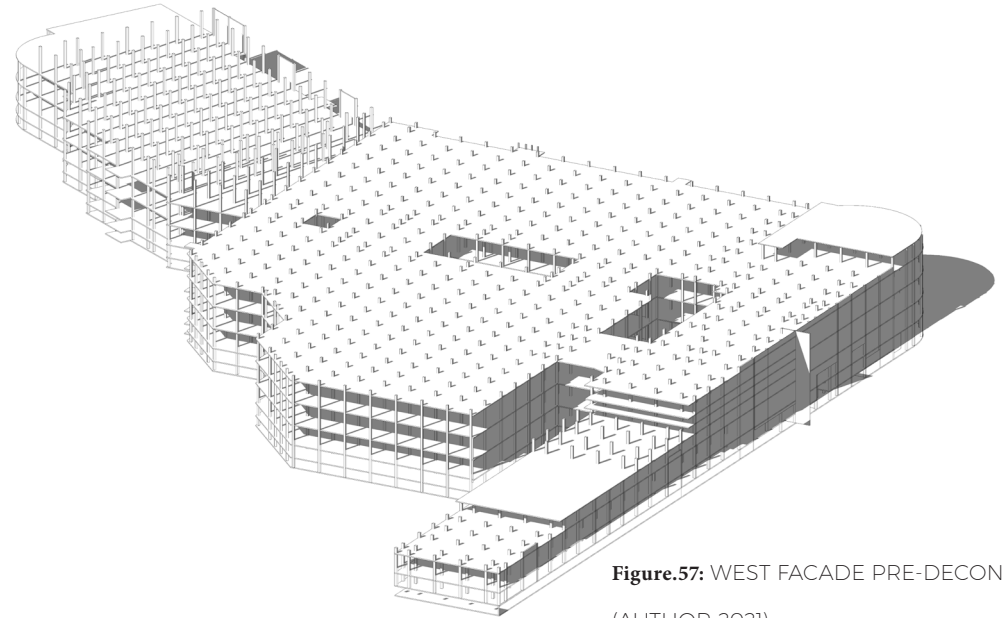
WEST FACADE PRE-DECONSTRUCTION
